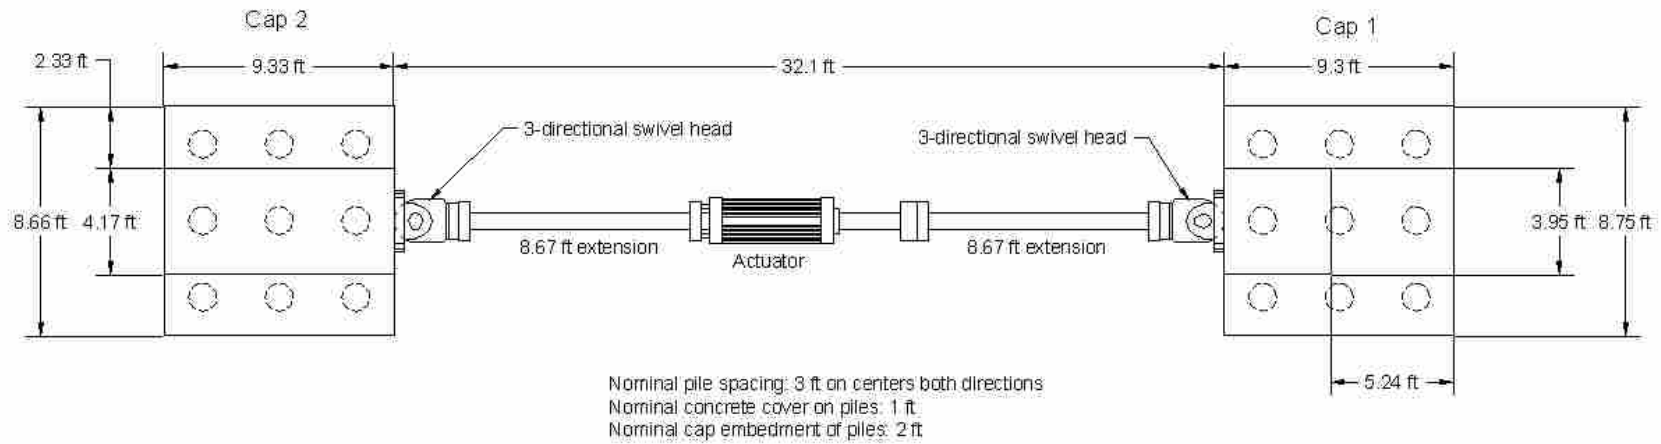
Plan and profile drawings of pile caps 1 and 2 during Test 1
